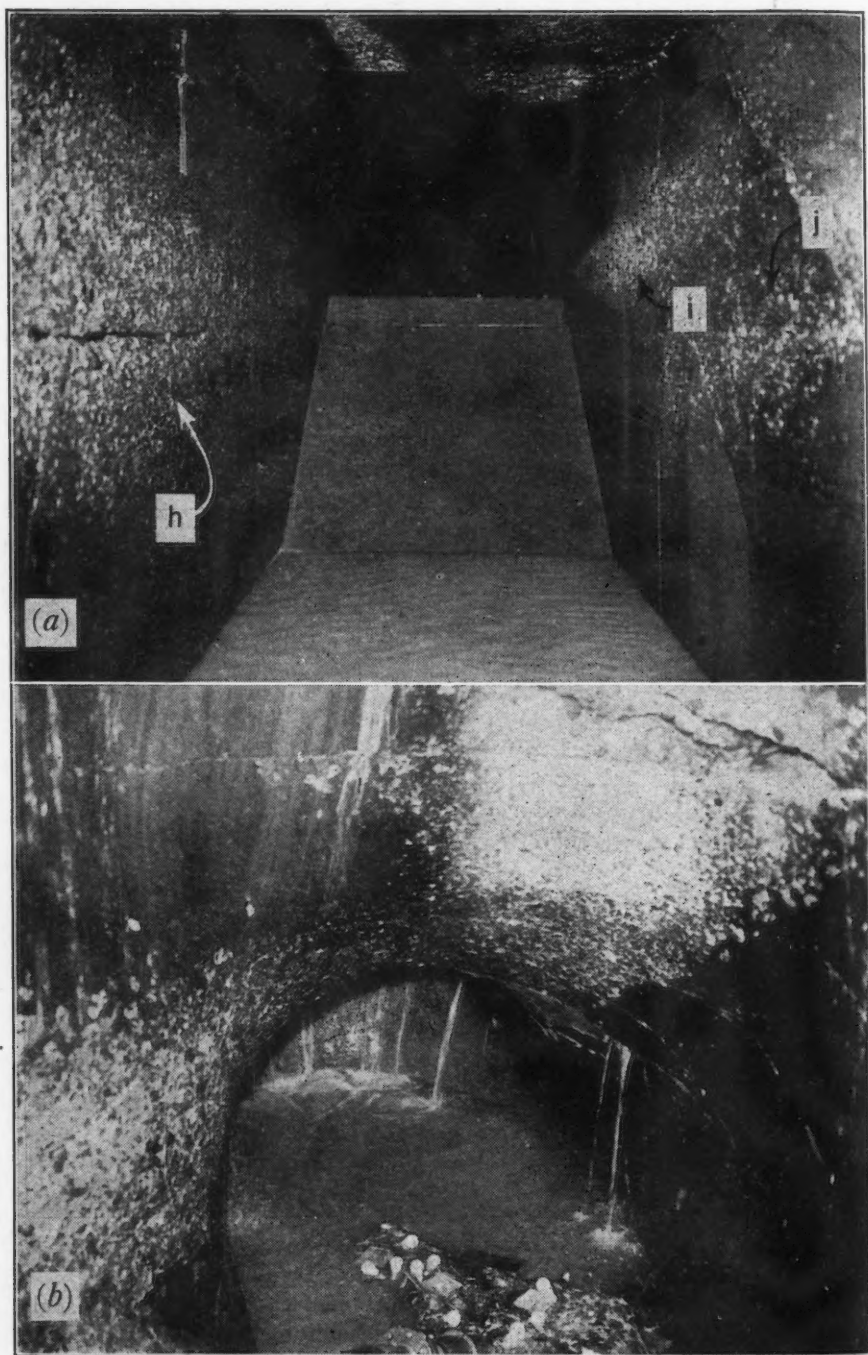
EXAMPLES OF PITTING IN THE LOCK-FILLING CULVERT OF WILSON DAM: (a) Downstream from a Constriction in the Culvert (7 ft by 9 ft); and (b) Downstream from a Sharp Bend
